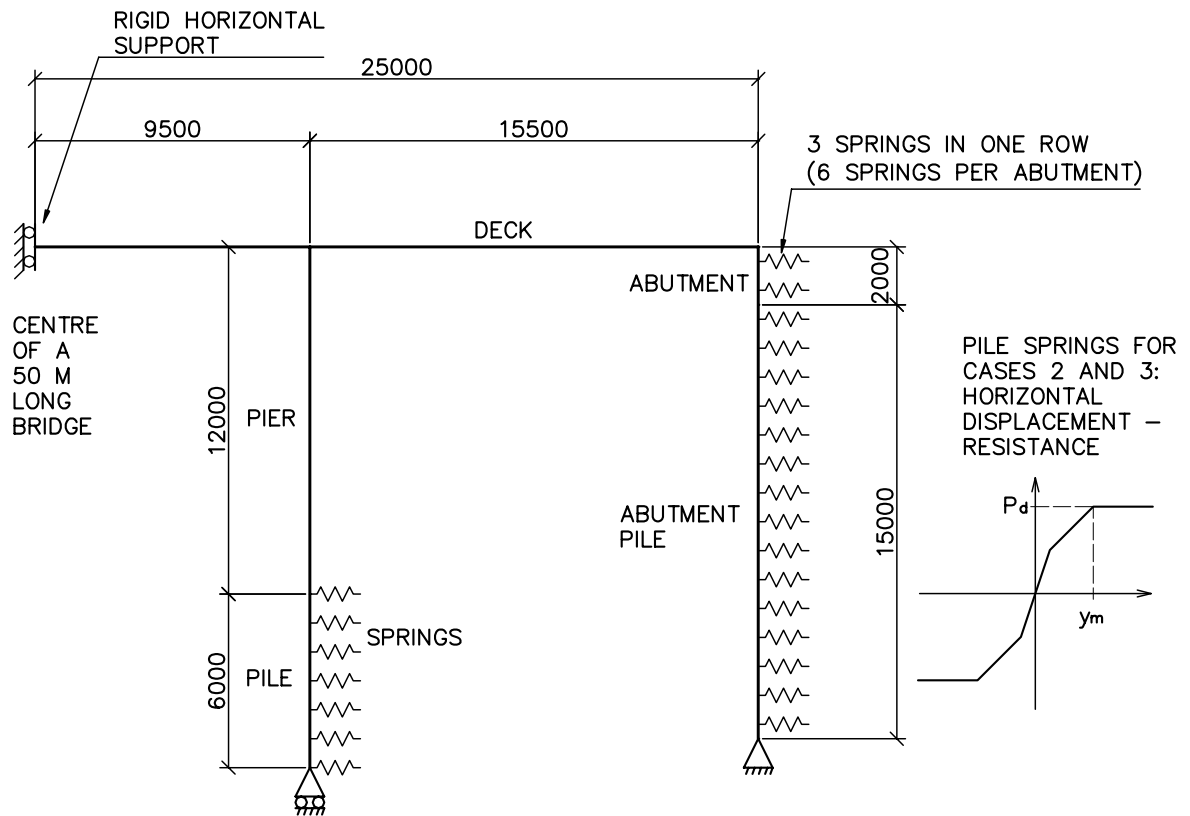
Structural model of Haavistonjoki Bridge with linear and non-linear springs. Transition slabs were not included. Side view.
